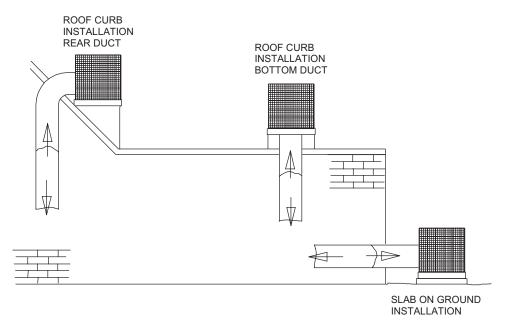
TYPICAL DUCT APPLICATIONS
